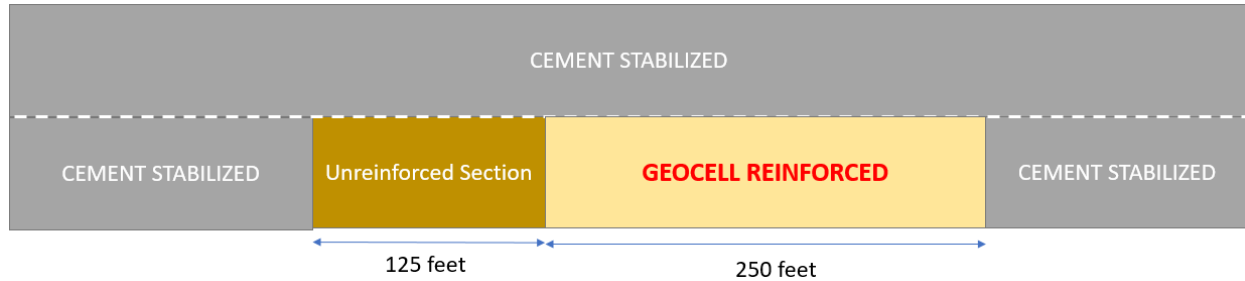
Pavement Section of Geocell-Reinforced at Testing Site.
